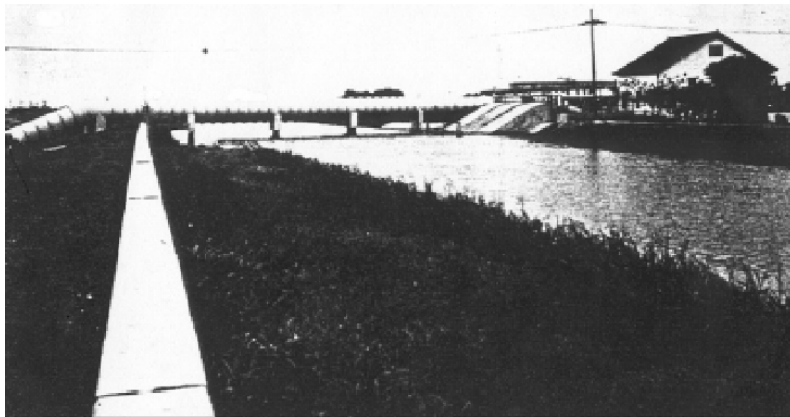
DPS4 showing 10 ft steel siphon over the London Avenue Outfall Canal (Courtesy of Sewerage and Water Board)
